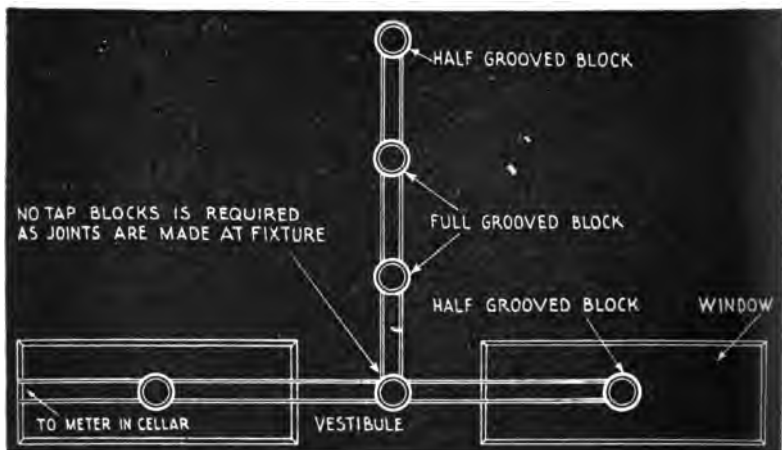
,982.—Typical and symmetrical store layout for wooden moulding wiring, showing half grooved and full grooved blocks.
